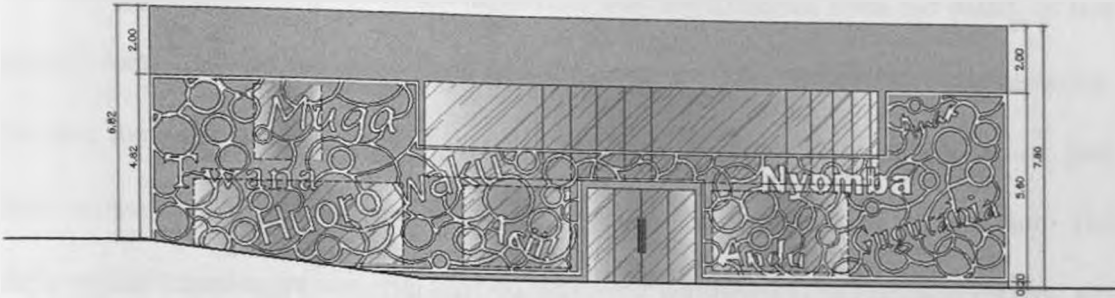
35 – Education building main facade facing the central plaza. Source: Author, 2013.
